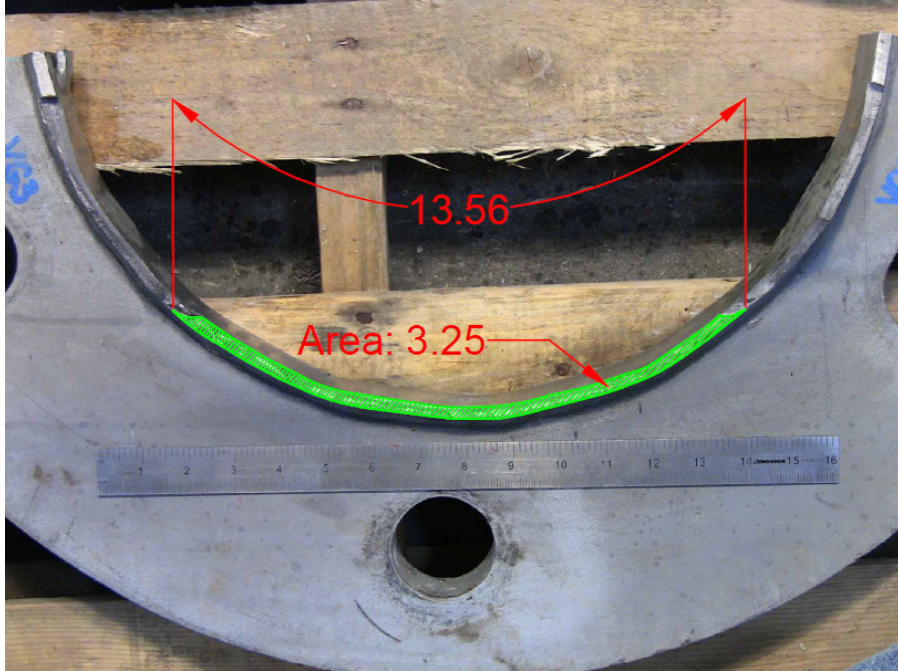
Photo. Specimen 2G1 fracture surface.
